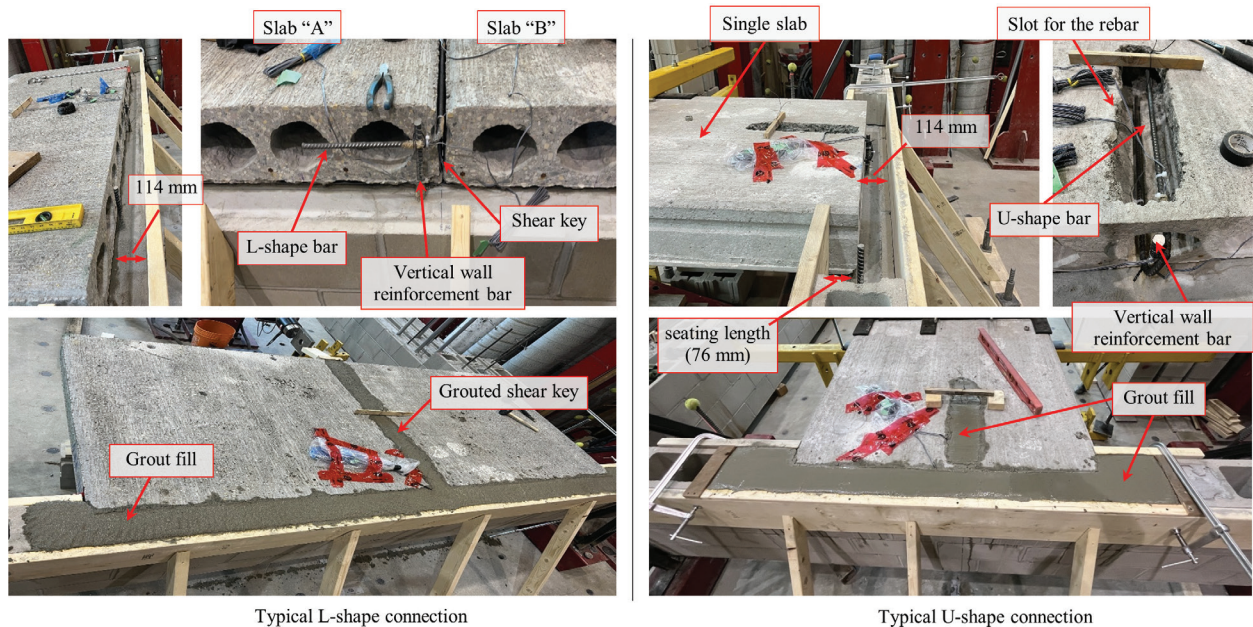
Details of test specimens EB-T-L-R (end bearing configuration with tensile loading and an L-shaped bar connection at the roof level) and EB-T-U-R (end bearing configuration with tensile loading and a U-shaped bar connection at the roof level). Note: 1 mm = 0.0394 in.
